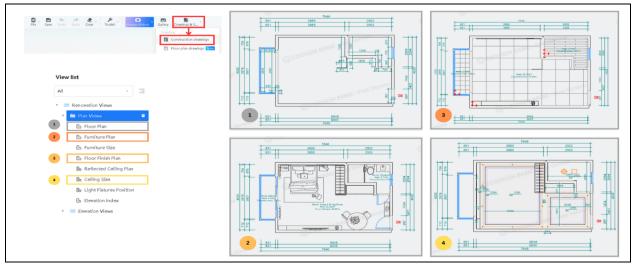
, The Floor Plan Drawings feature in Full Color style. [3]
